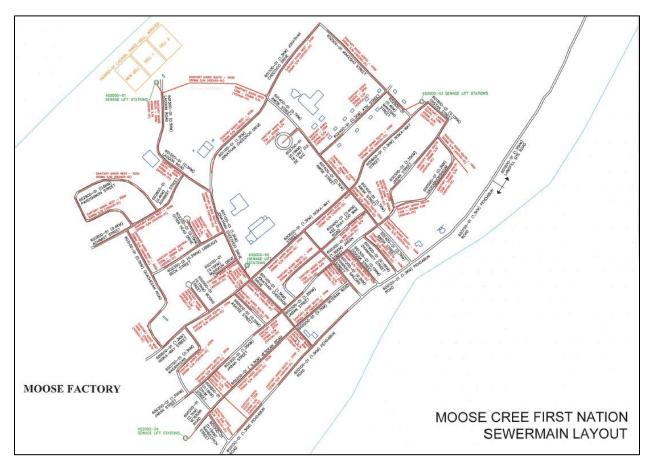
Moose Factory – Sewer Main and Treatment Lagoons Layout (Source: ACRS Report by Saulteaux Consulting and Engineering. Inspected Summer 2016)
